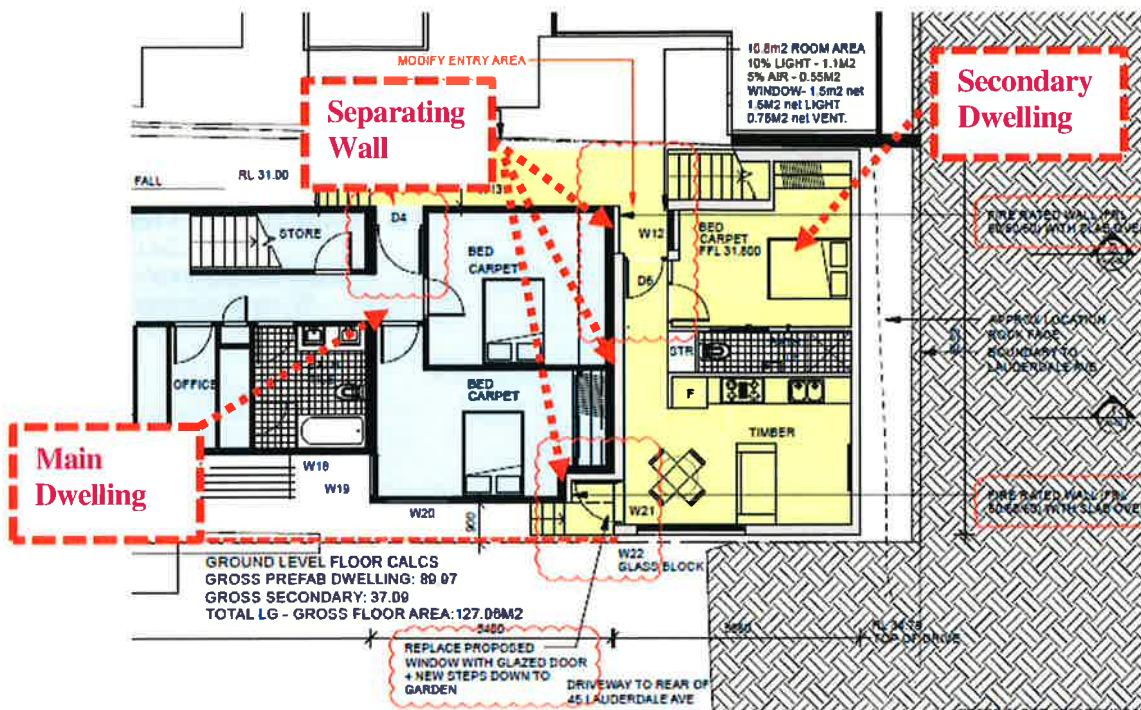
Ground Floor showing Secondary Dwelling and Separating Wall
